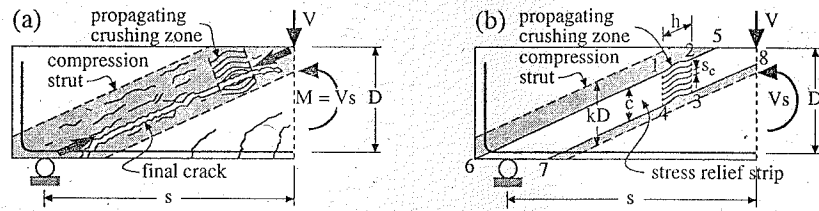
(a) Compression strut in a beam without stirrups and crushing zone propagating across the compression strut during failure, (b) stress relief zones caused by crushing band propagating across compression strut in beams of different sizes.
